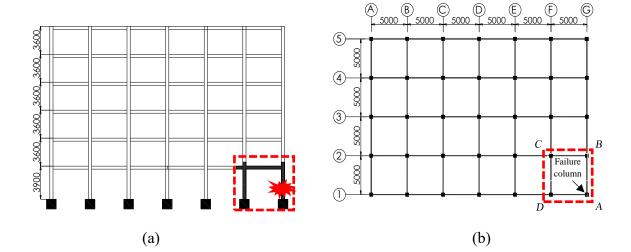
Prototype structure (unit: in mm): (a) elevation; (b) floor plan
